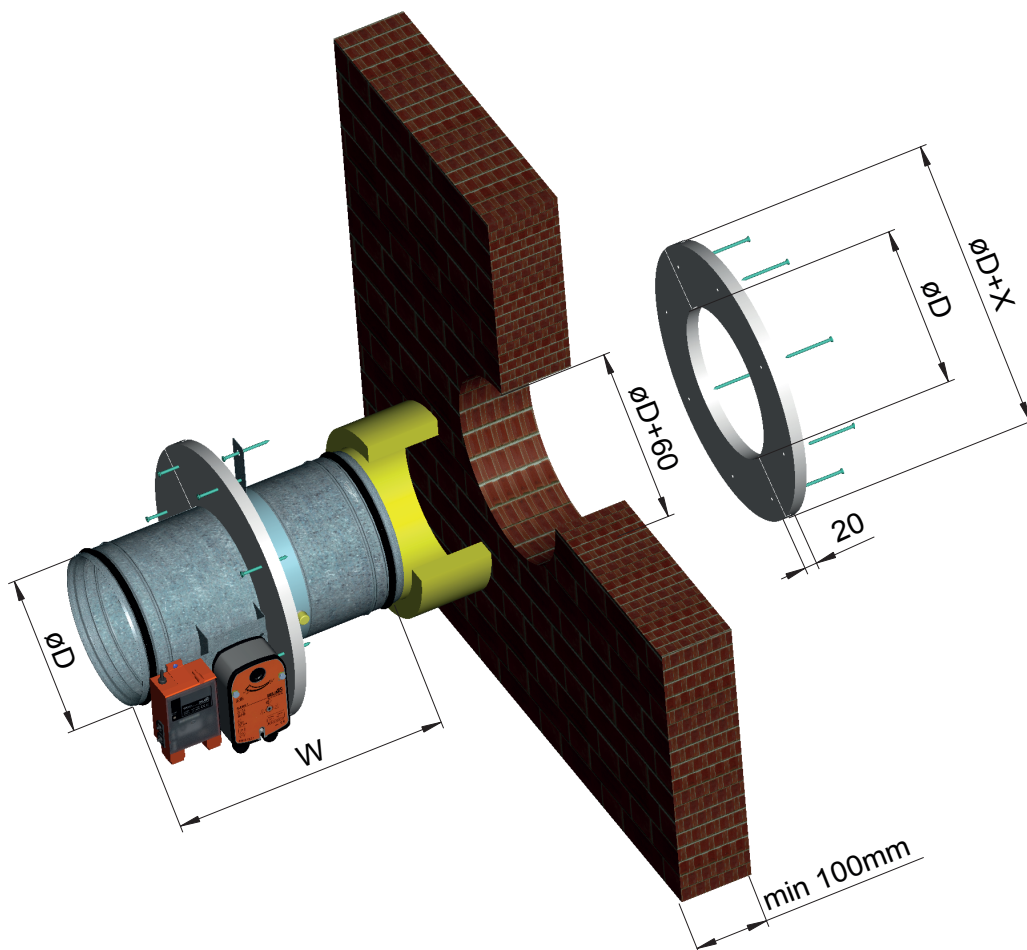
Installation of round fire damper with gypsum mixture or concrete
